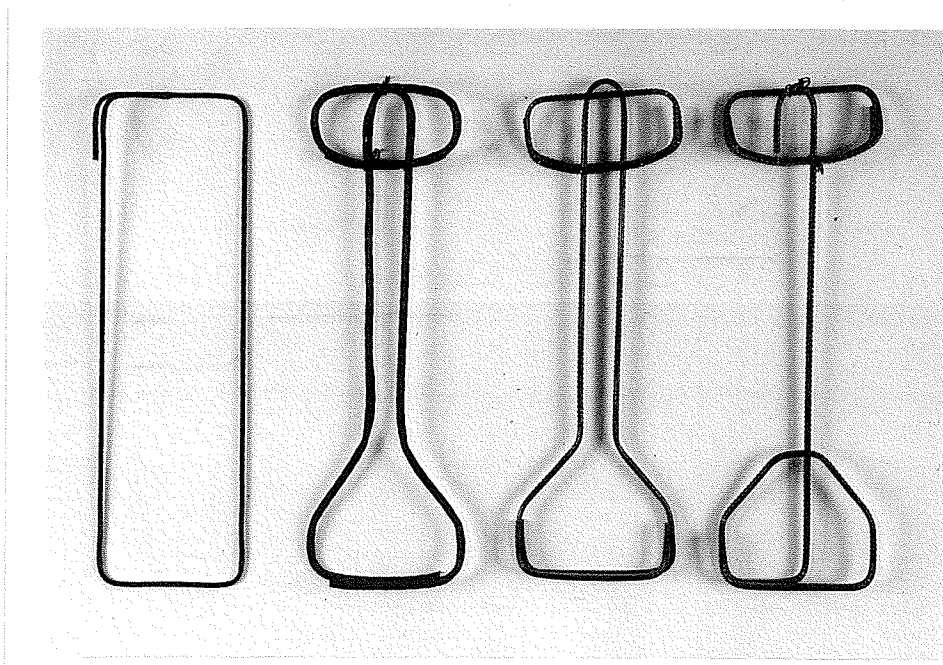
End block reinforcement at anchorage zone of external prestressing
